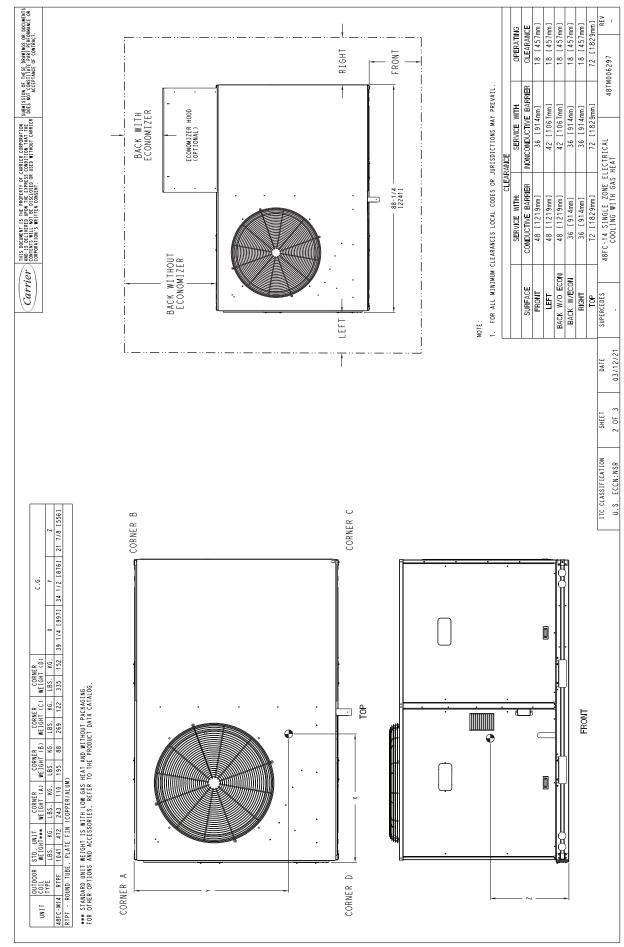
Unit Dimensional Drawing – Sizes 14 (cont)
